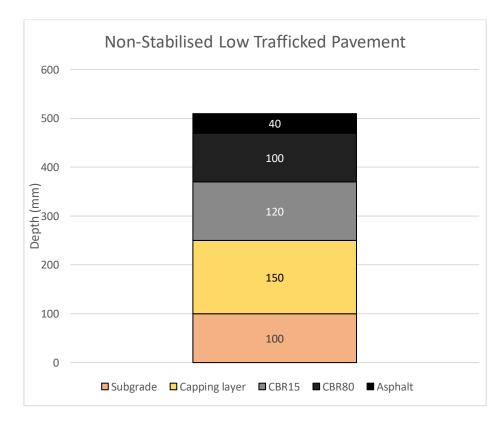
Pavement design for non-stabilised low traffic road (Author 2019)
